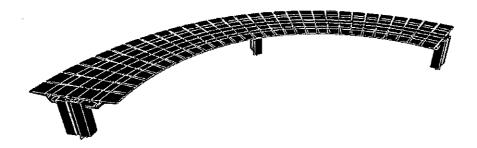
Typical Two Span Curved Flyover Bridge (Solid Model)
